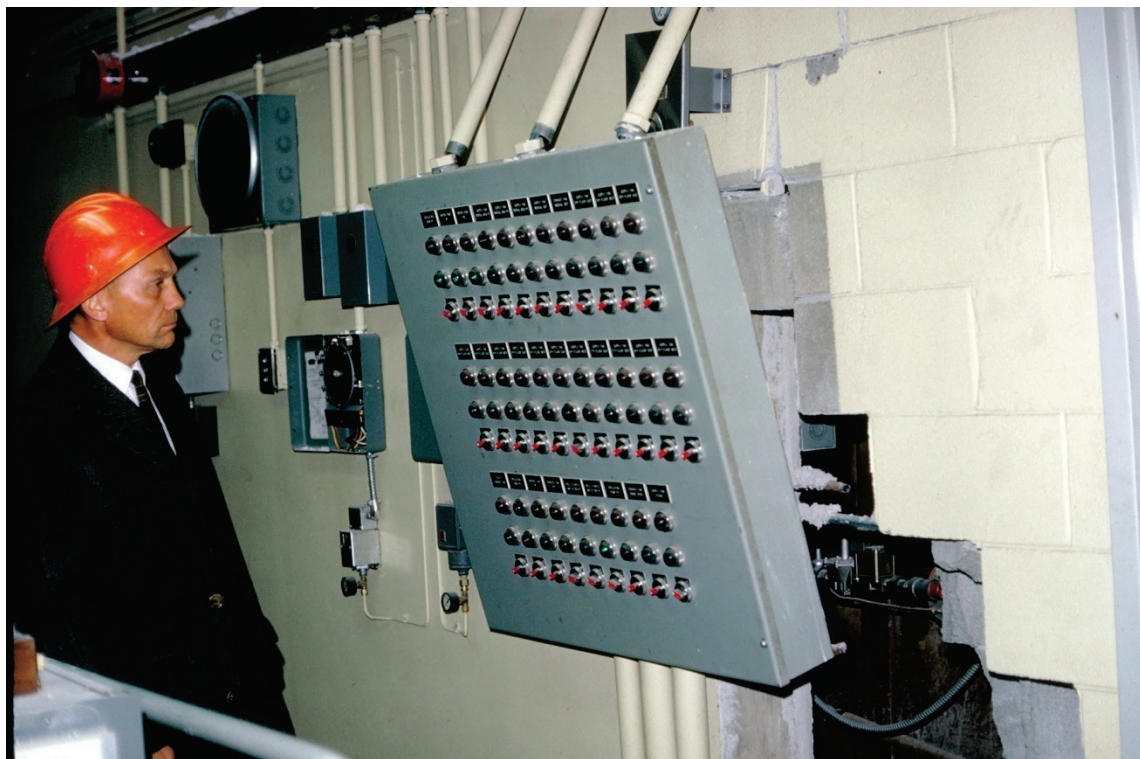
Dislodged panel board due to failure of hollow concrete block partition wall in the 1964 magnitude-9.2 Anchorage, Alaska earthquake (Photo courtesy of PEER Steinbrugge Collection, No. S2144).
